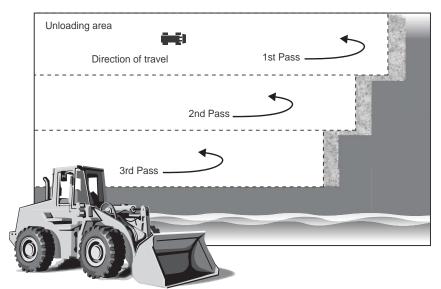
Direct Mechanical Removal Using a Front-end Loader
